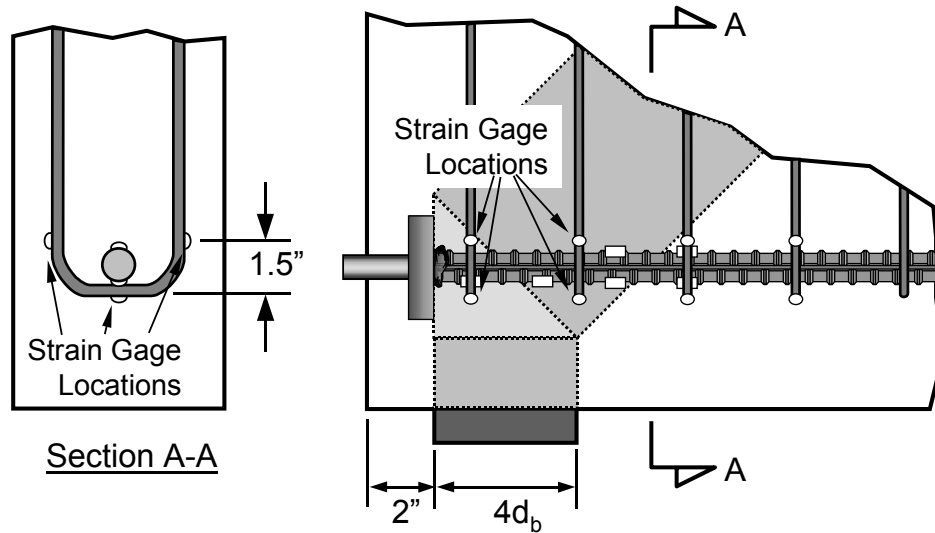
Placement of instrumentation on stirrups of confined specimens
